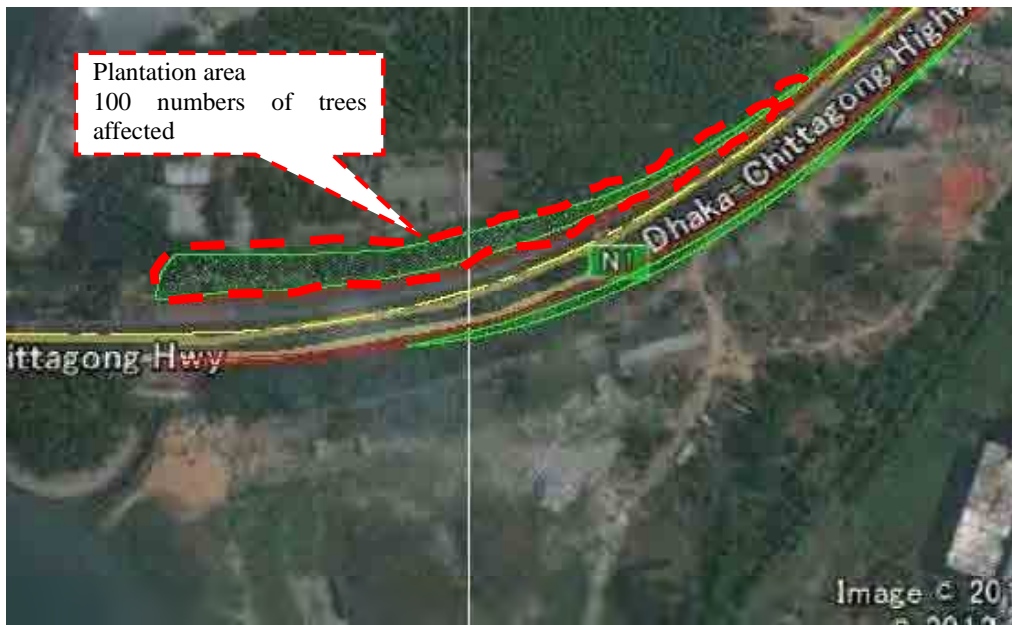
Location of Plantation Area (in Meghna Bridge Site Only)
